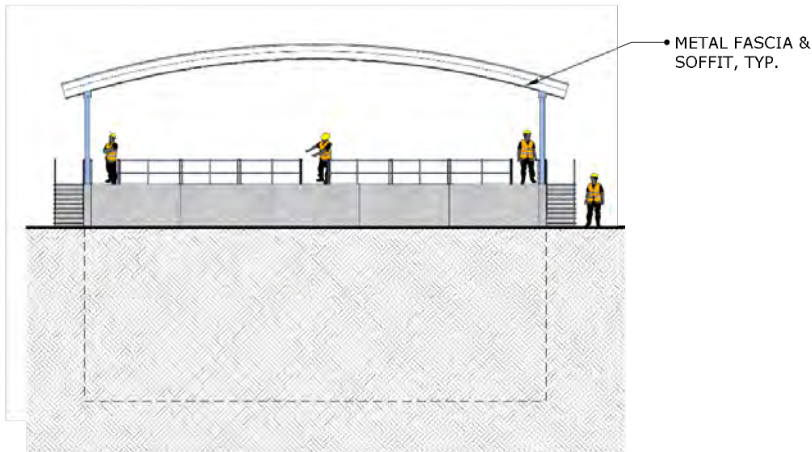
Ballasted Flocculation Canopies North Elevation; South Elevation similar
